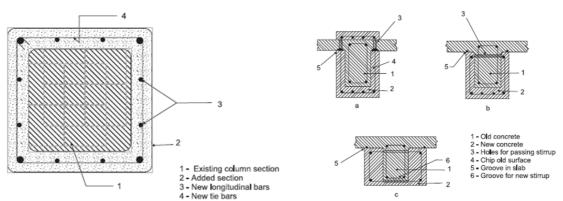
a) Jacketing a concrete column, b) Increasing the section and reinforcement of existing beams
